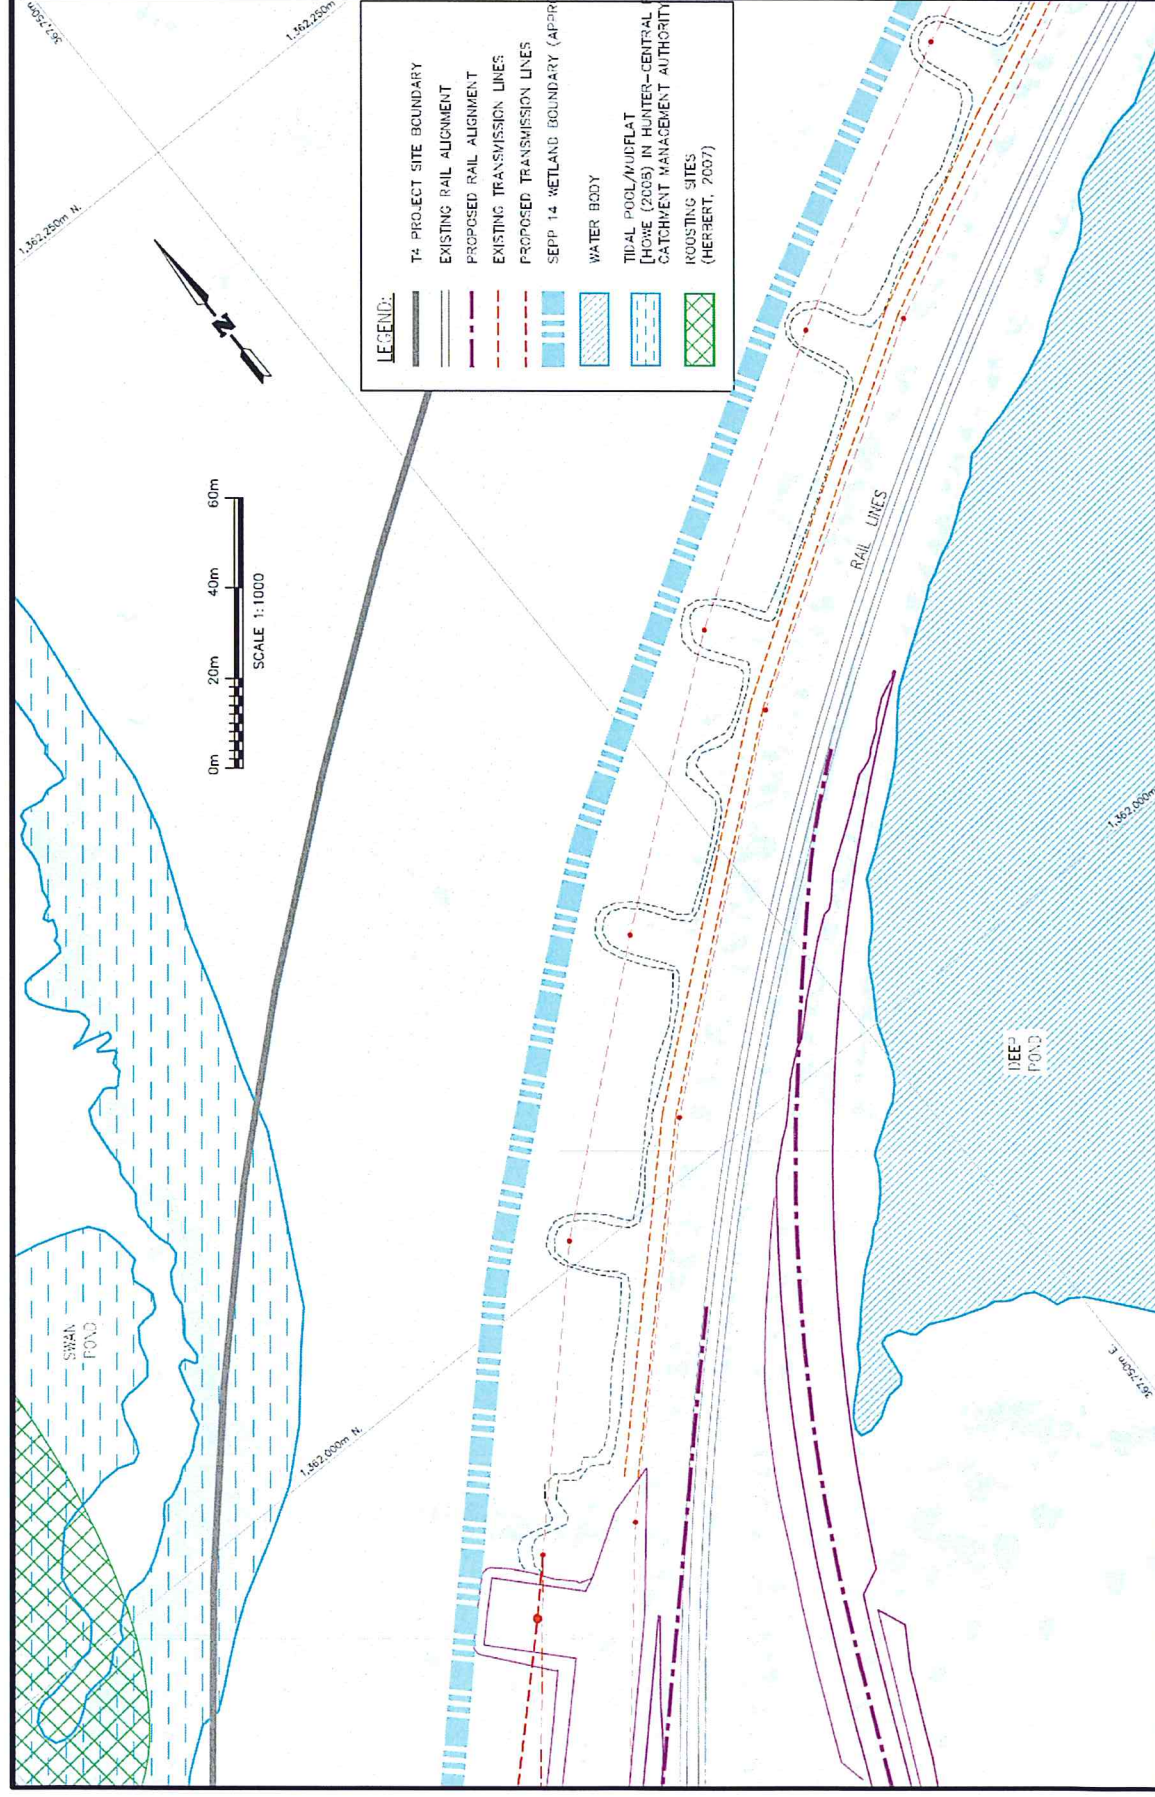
Proposed Rail Flyover (Plan 3 of 3)
